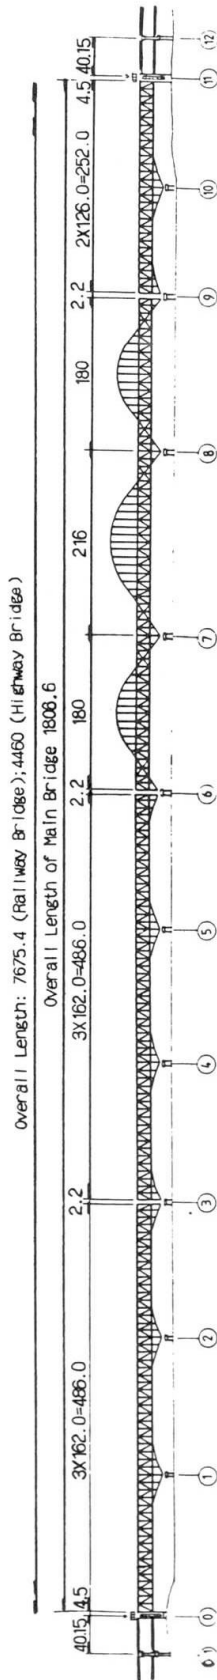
General Layout of Steel Truss of Bridge Proper (m)
